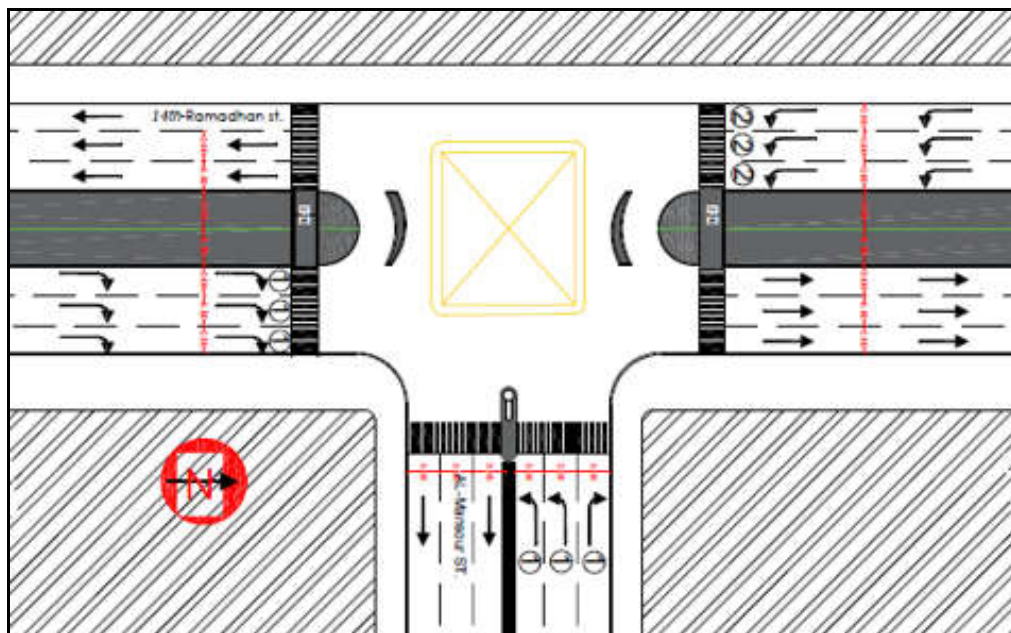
Geometric Layout of the Second Re-Design Proposal
